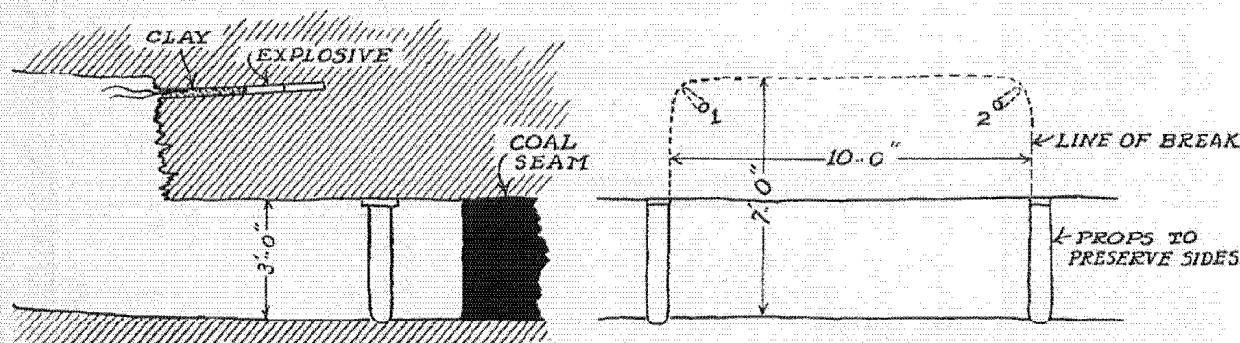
Side and front elevation of a typical example of ripping a gateway in longwall working
